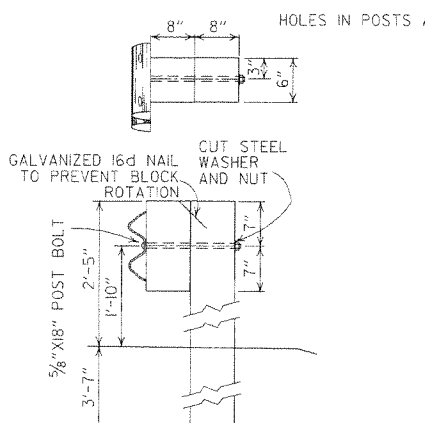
DETAILS OF STEEL LINE POST CONNECTIONS (W-BEAM)
